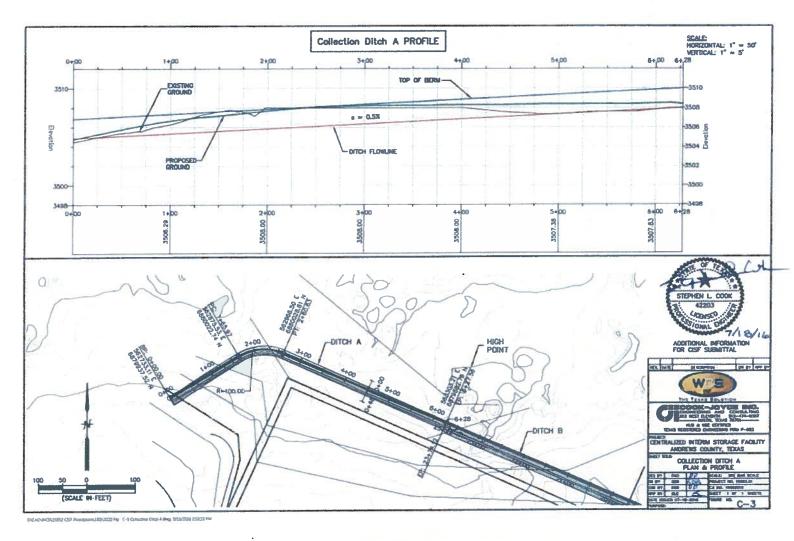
CJI C-3 Collection Ditch A Plan & Profile
